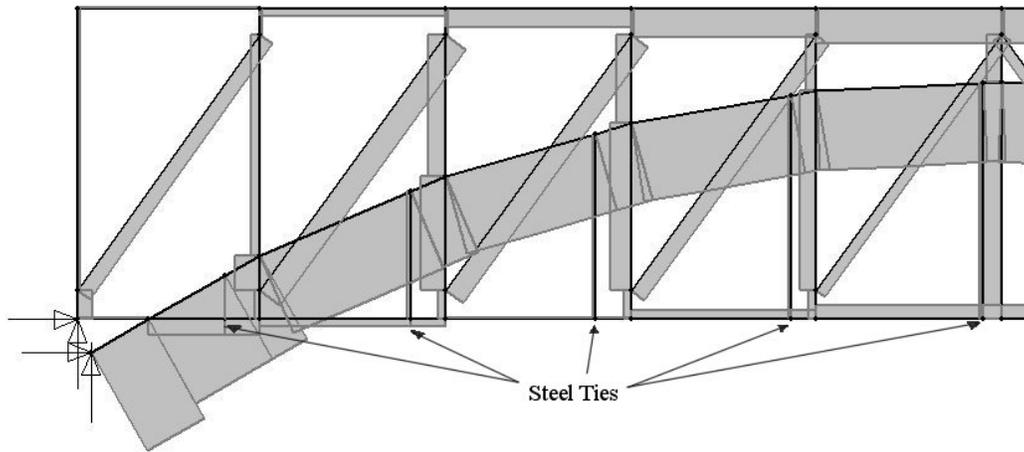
Axial Forces in Arch-Truss with Steel Ties due to Dead plus Mid-Span Live Load.
